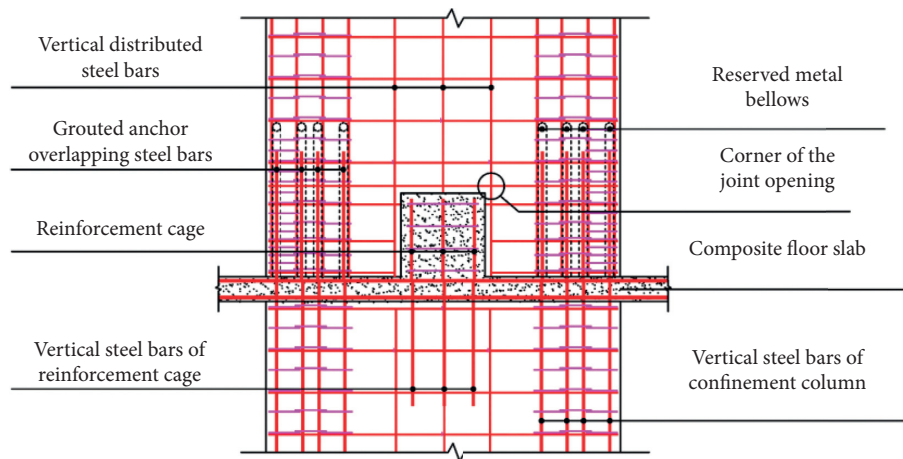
Reinforcement layout plan of precast shear wall with the proposed reinforced tenon.
